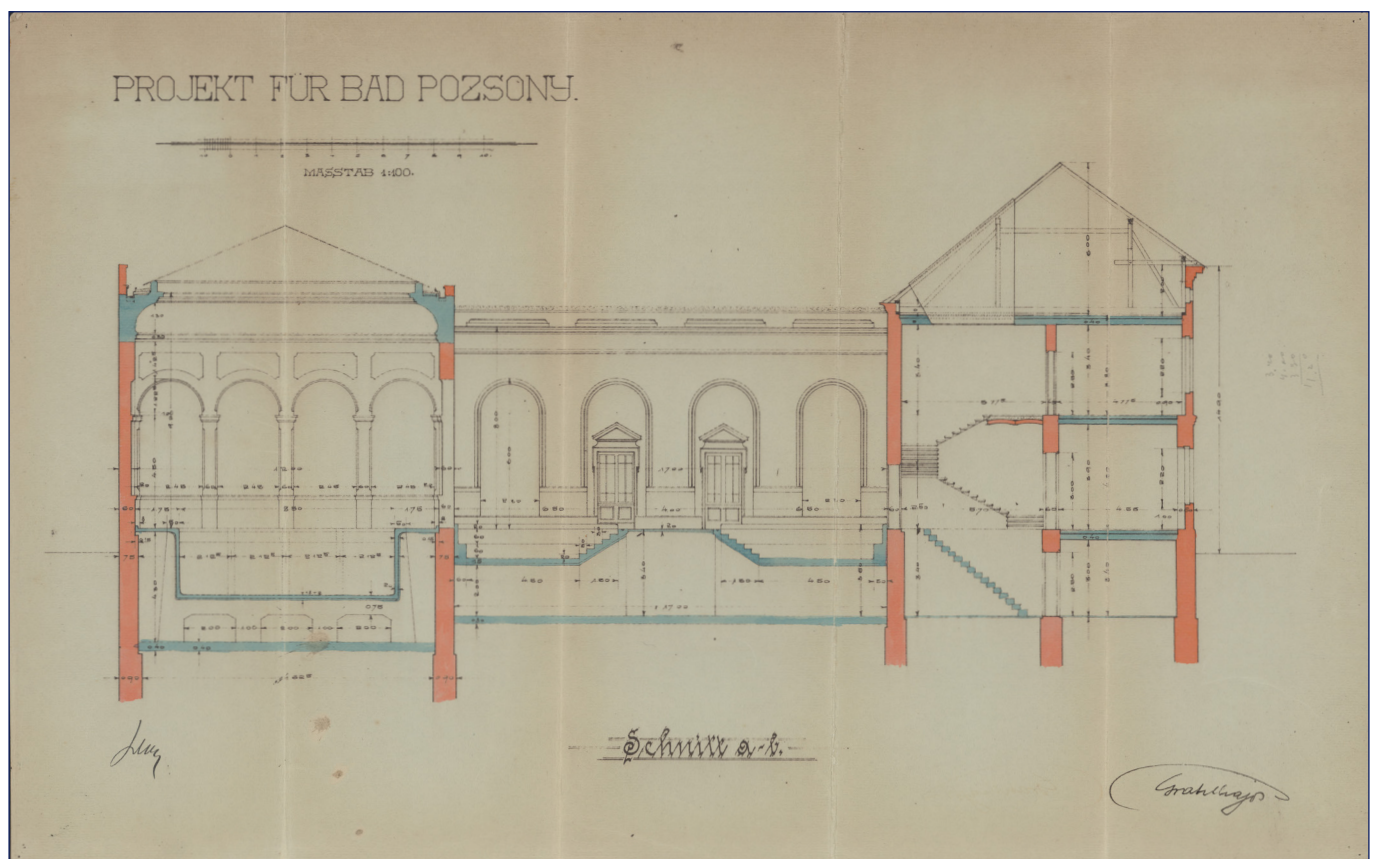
Section drawing, 1914 (Source: Bratislava City Archive, File “Grössling Street”)
